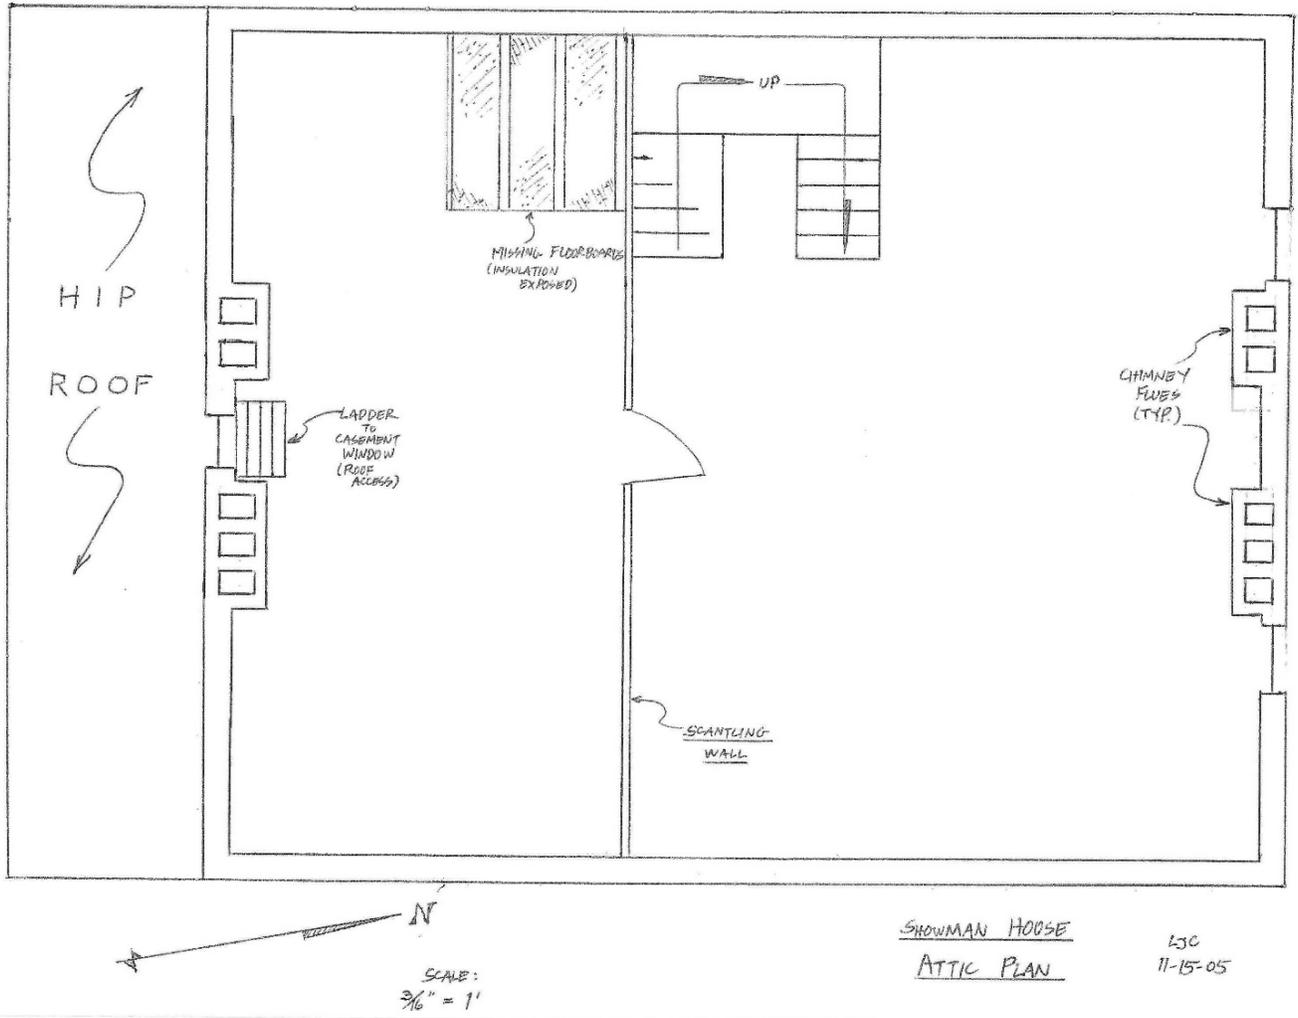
Attic View. Antietam Farm house plans courtesy of Leslie Clark.
